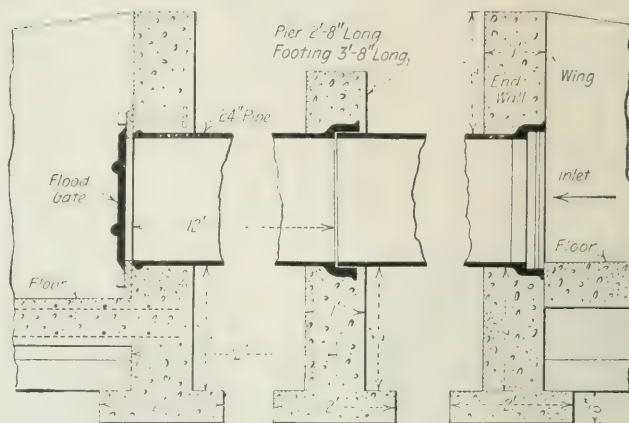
CAST-IRON PIPE CULVERT, WITH CONCRETE SUPPORTS AND FITTED WITH FLAP GATE
